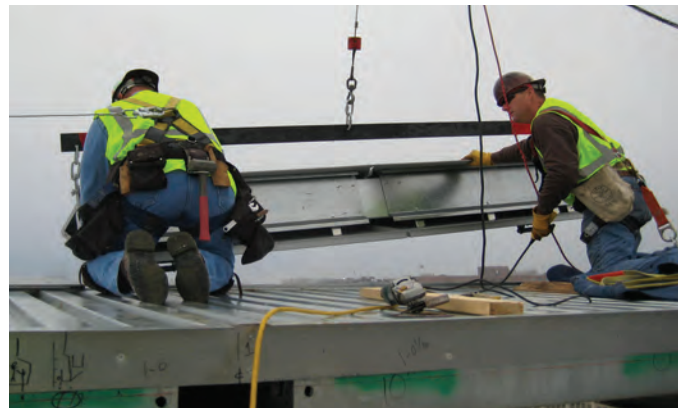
Unitized cornice assembly: Hoisted using wire slings slung through unfinished framing sections inside the unit.
